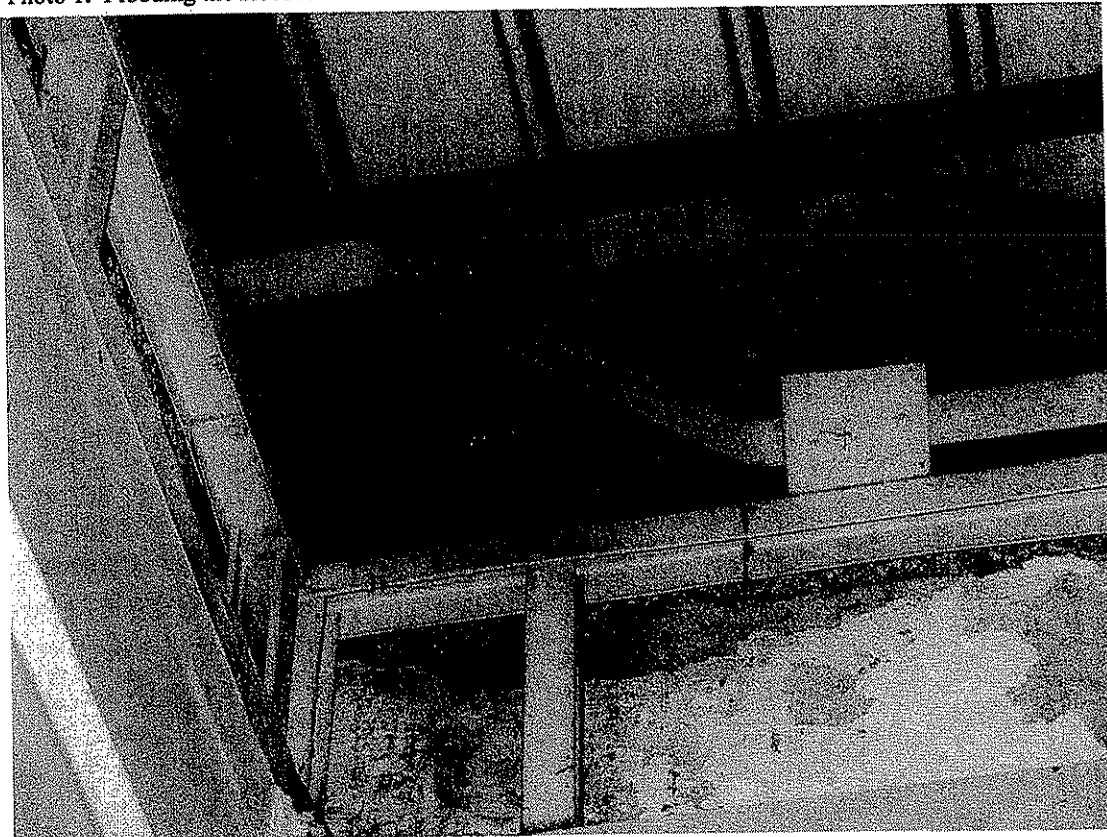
Water Coming Through the Roof in North-West Corner of Low Roof
